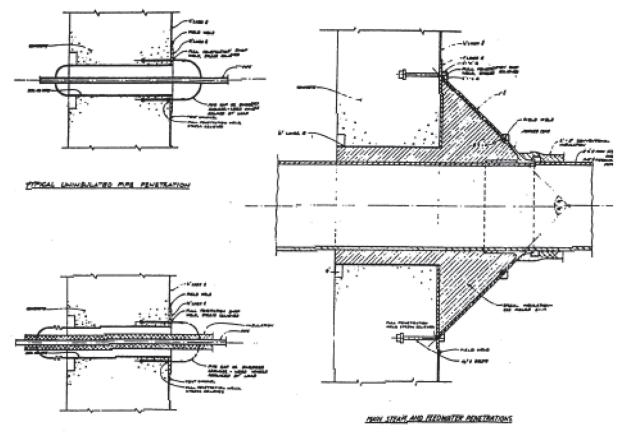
CONTAINMENT STRUCTURE - TYPICAL PIPING PENETRATIONS
